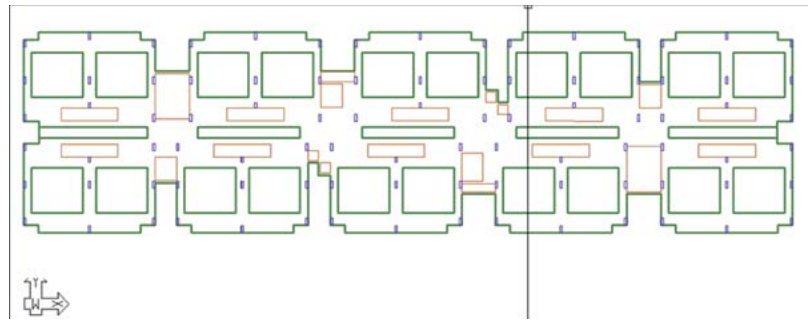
Structural plan of a typical floor of the government housing project, Chennai
